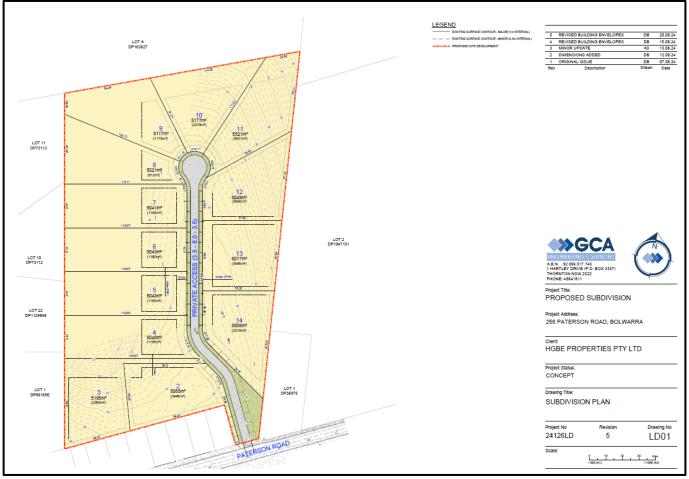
Plan of subdivision (GCA Engineering Solutions)
